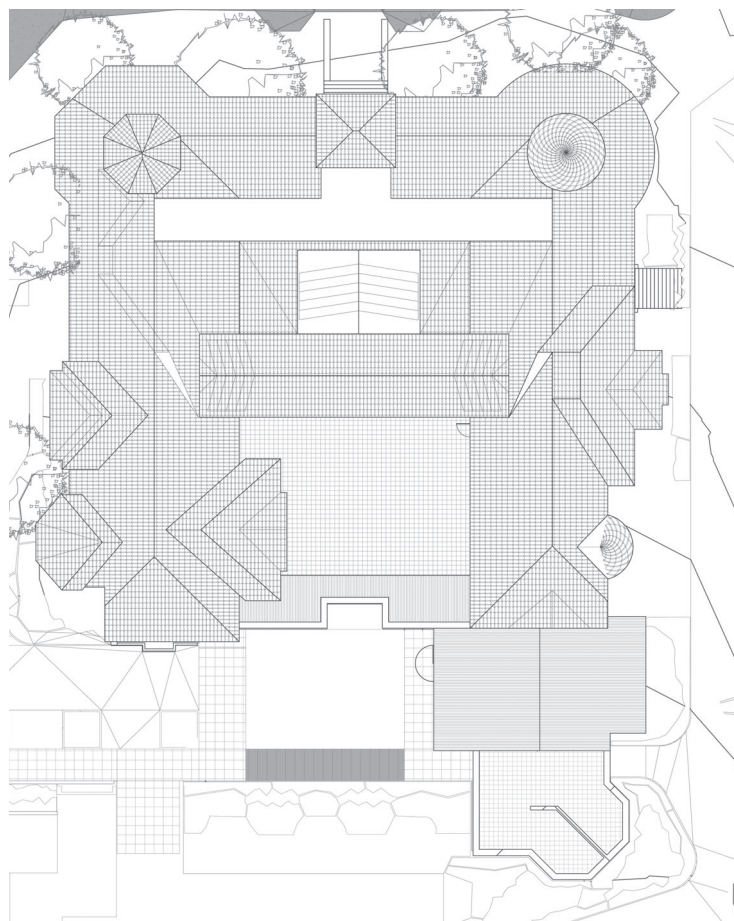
St John of God Richmond Hospital. Proposed Roof Plan.
